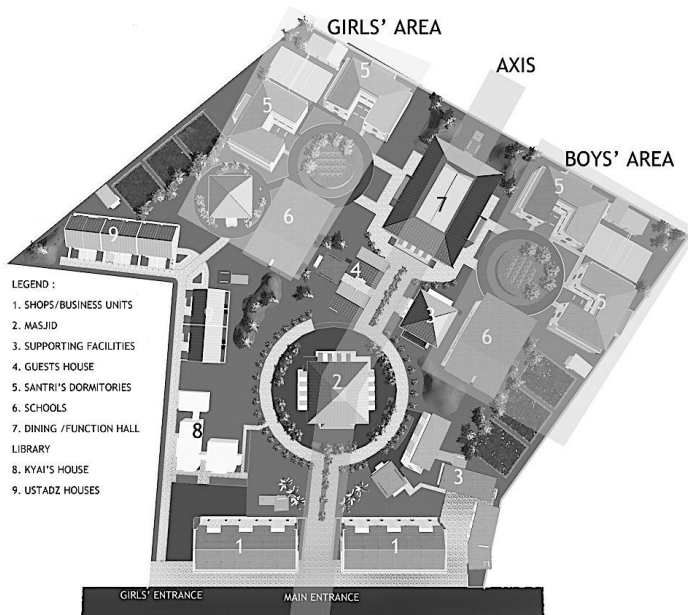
The site plan of Pondok Pesantren Al Fath Ma'had Palembang
